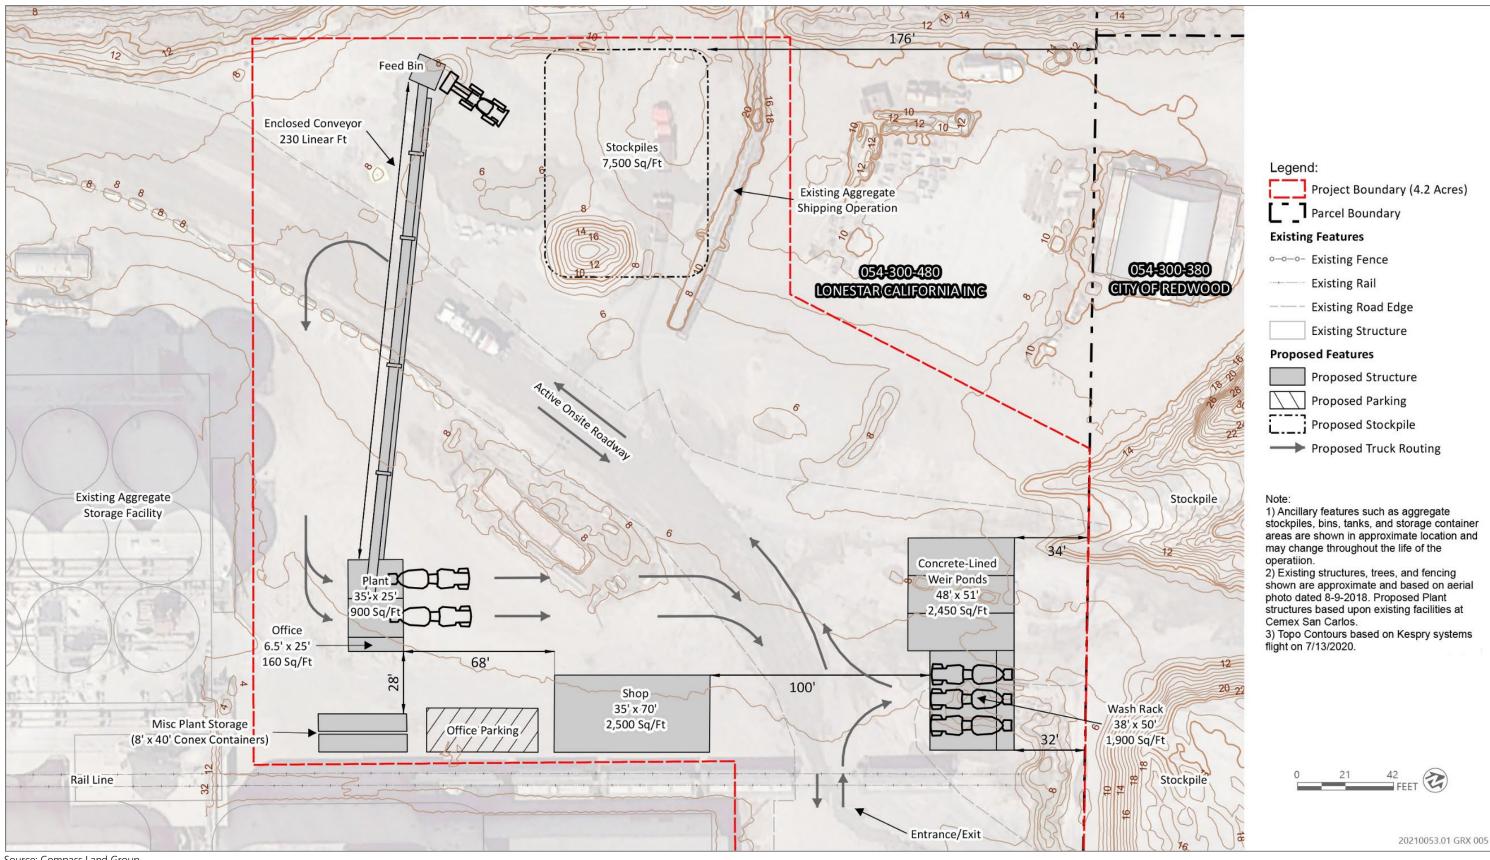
Proposed Site Plan Detail (1 of 2)
